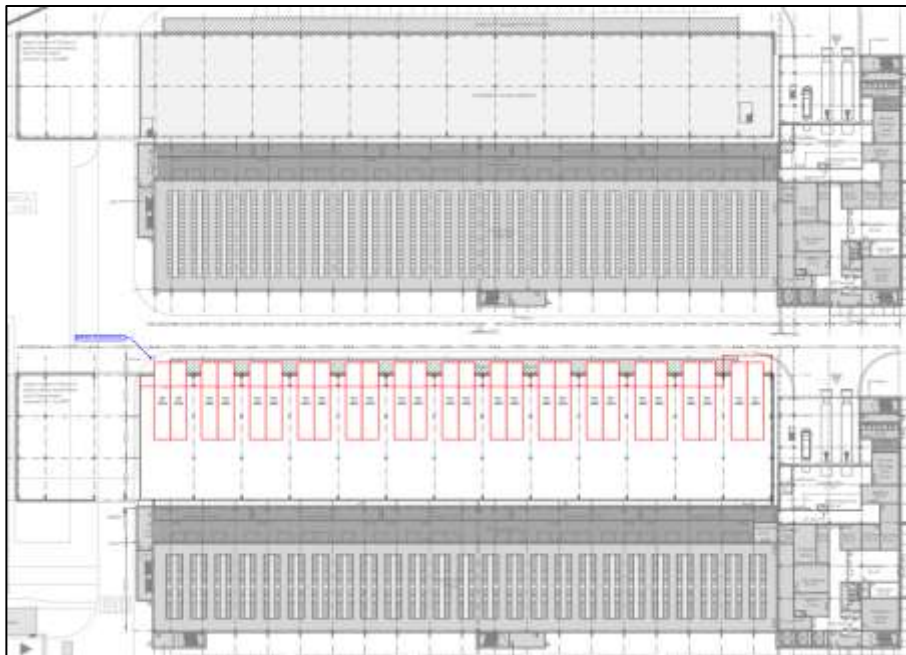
First Floor Gantry Layout (CEP Layout) – Buildings A & B
